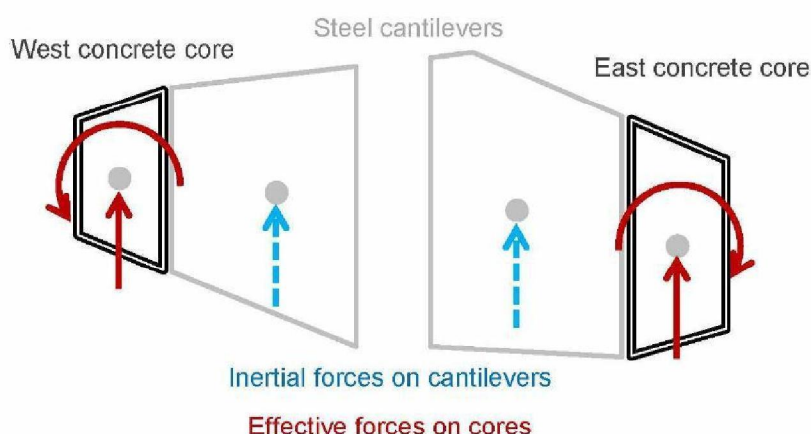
Transmission of inertial forces from steel structure to concrete cores
